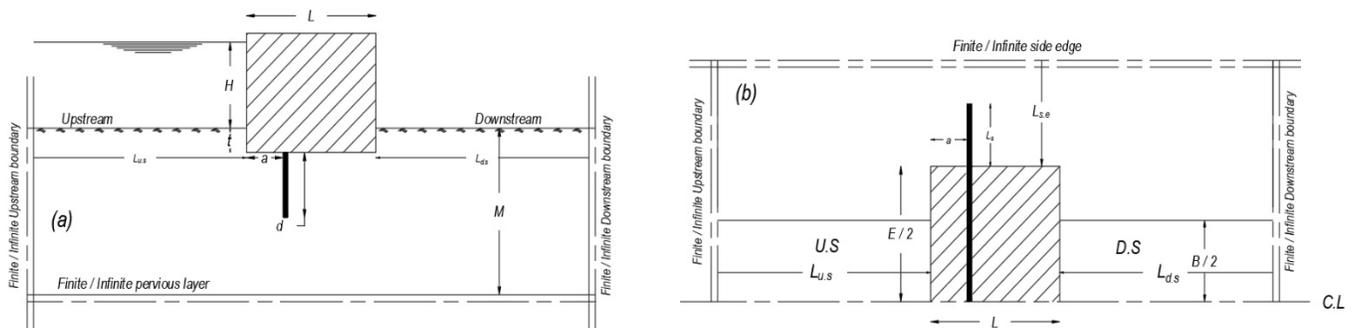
Schematic sketch of the studied problem (a) elevation (b) half plan
